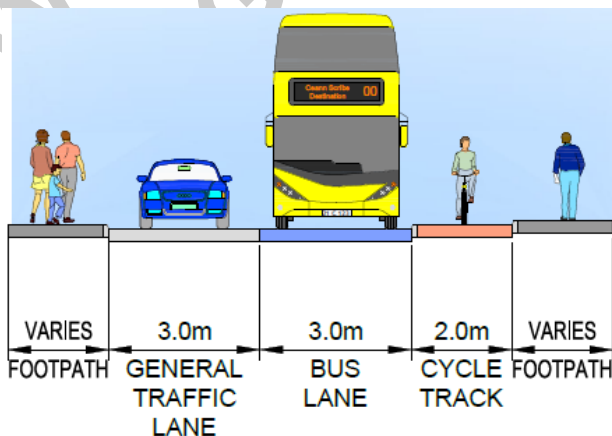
Section 2C, Proposed Option 4 – Cross Section A-A
